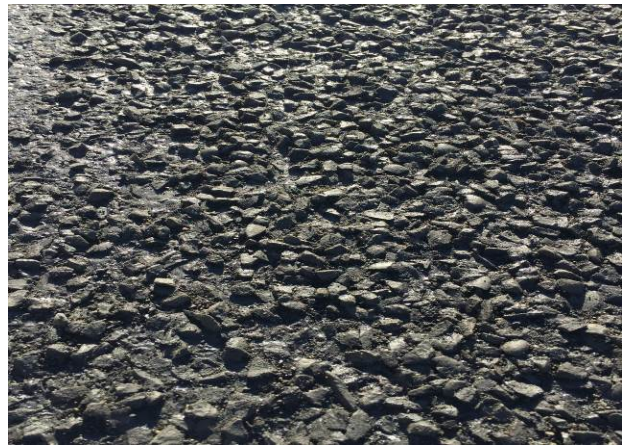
Close-up of the Formula 3 wheel path chip seal with choke.
